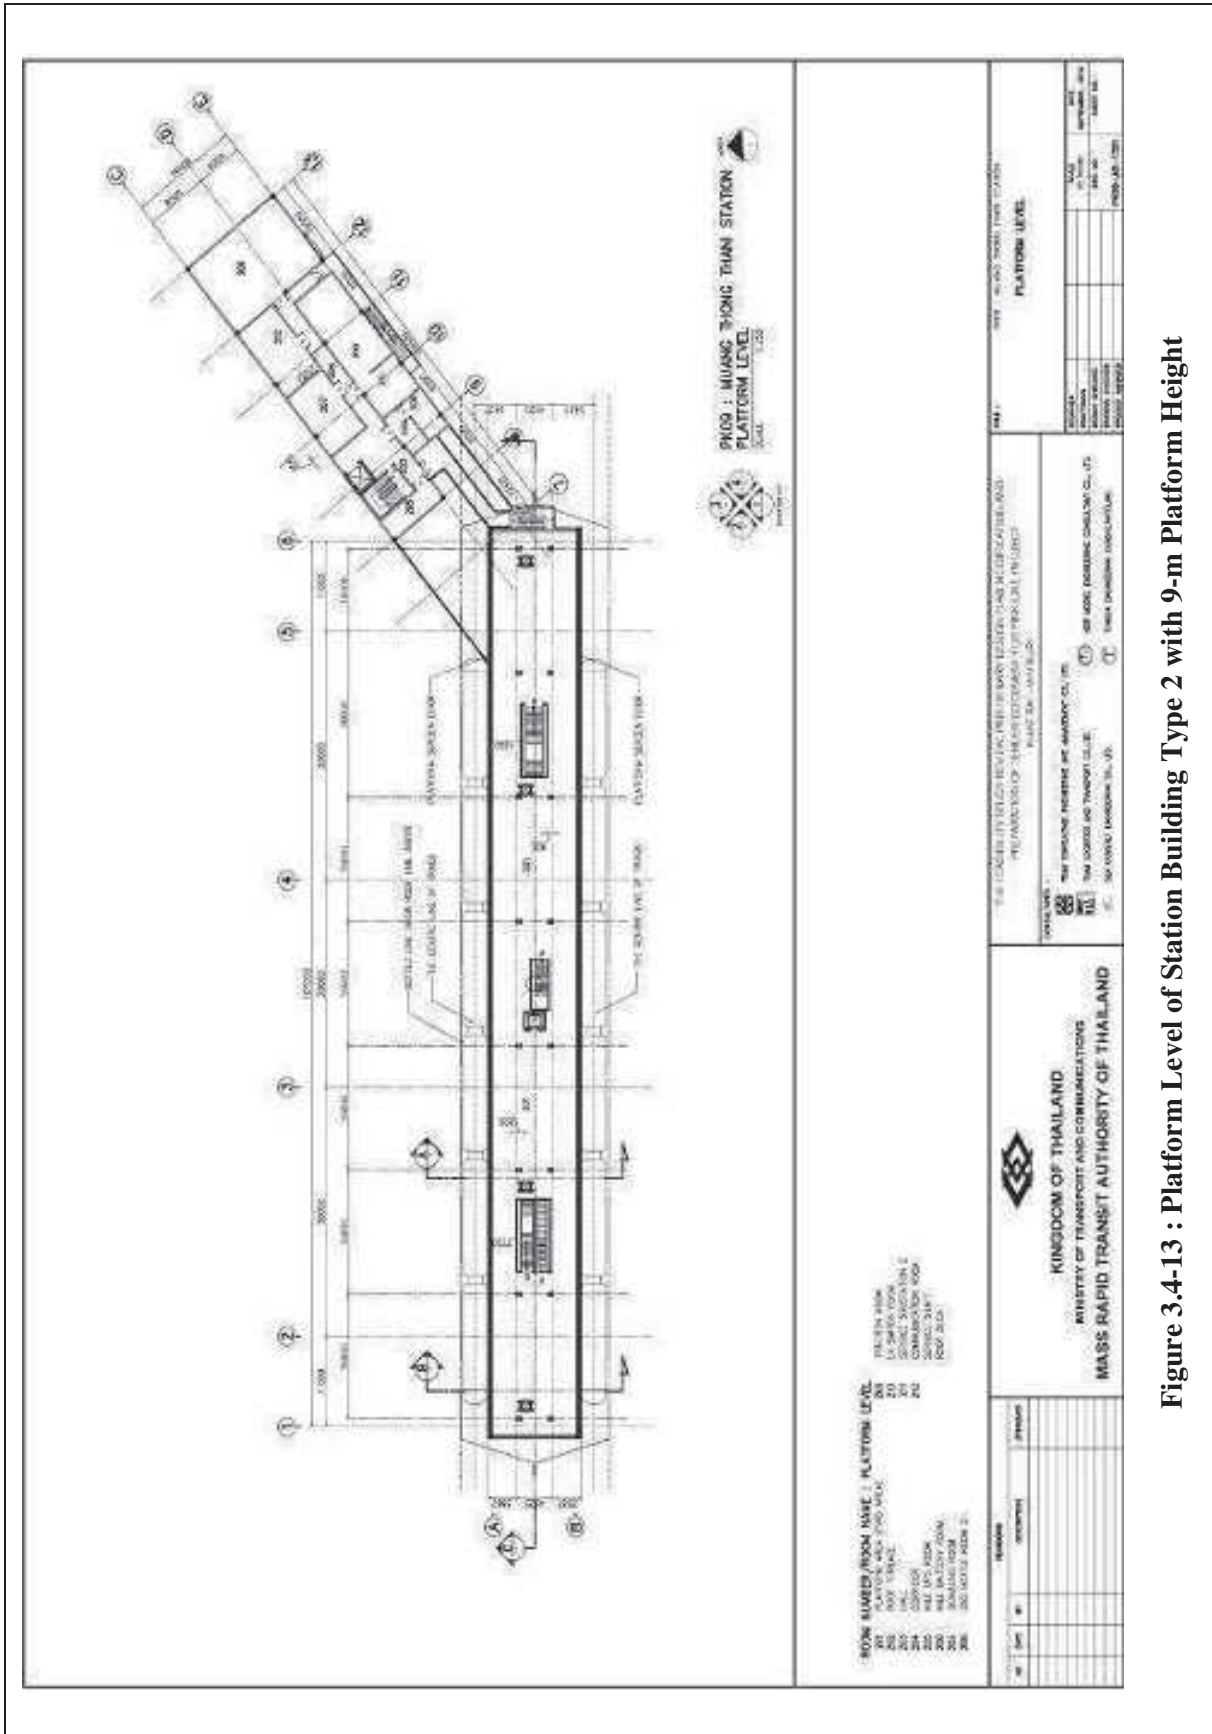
Platform Level of Station Building Type 2 with 9-m Platform Height
